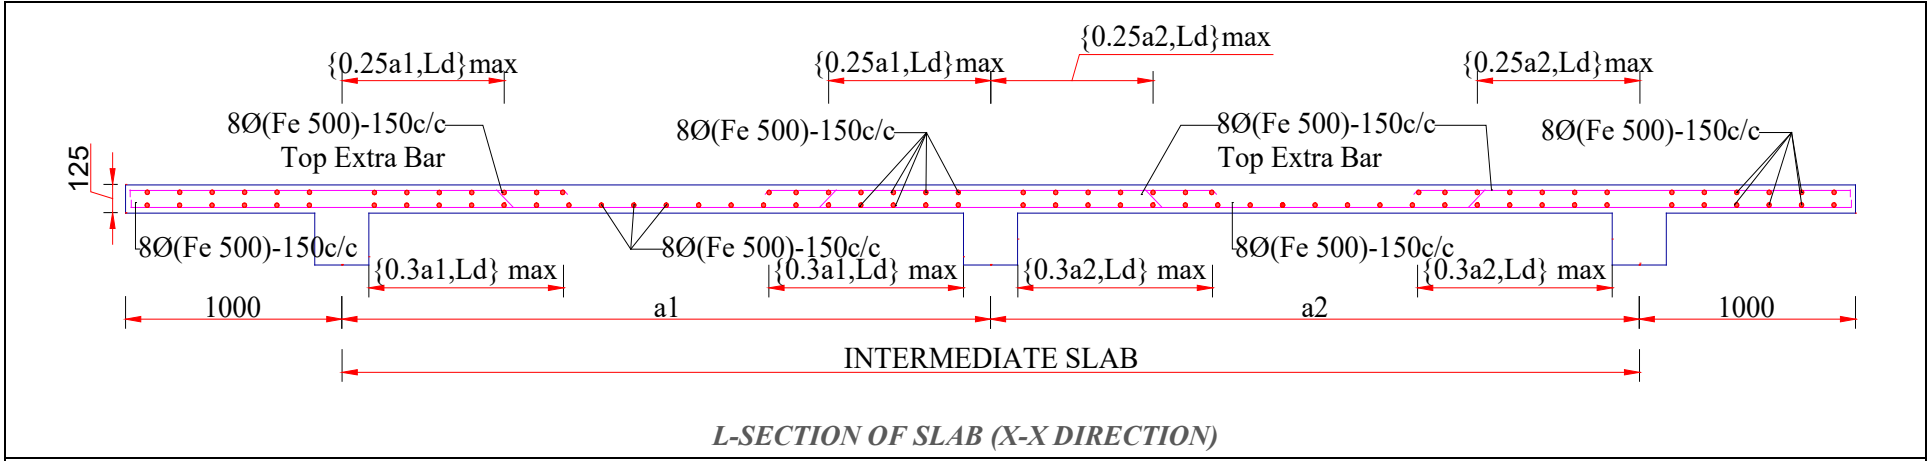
TYPICAL FLOOR SLAB DETAIL (OPTION II)
